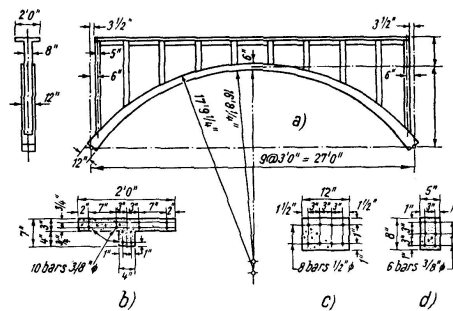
Reinforced-concrete high-deck arch: (a) main dimensions; (b) section of deck; (c) section of arch rib; (d) section of post
